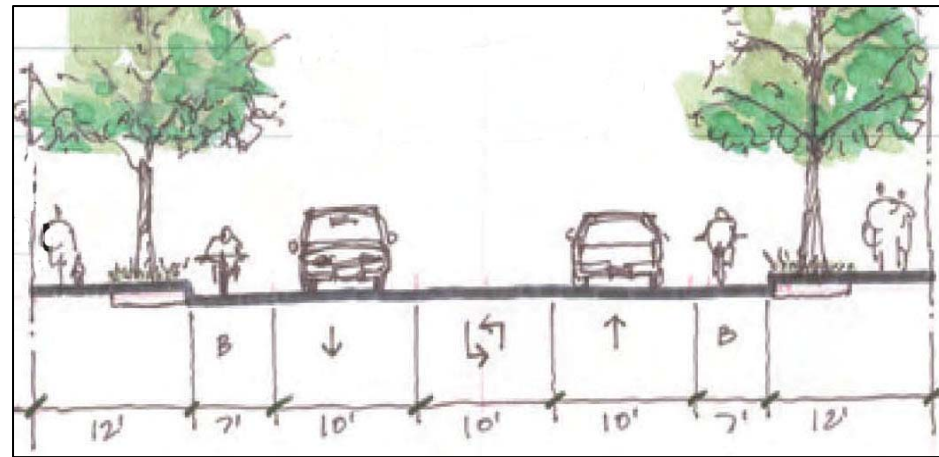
Removing one travel lane makes it possible to widen sidewalks and add bike lanes on this 68-foot wide street.
